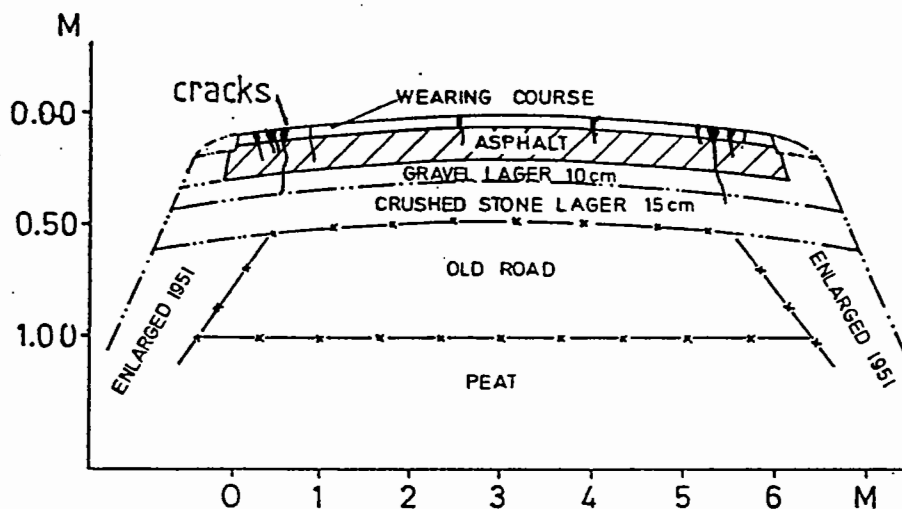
General Pavement Configuration Prior to Treatment (after Kassner (37))
